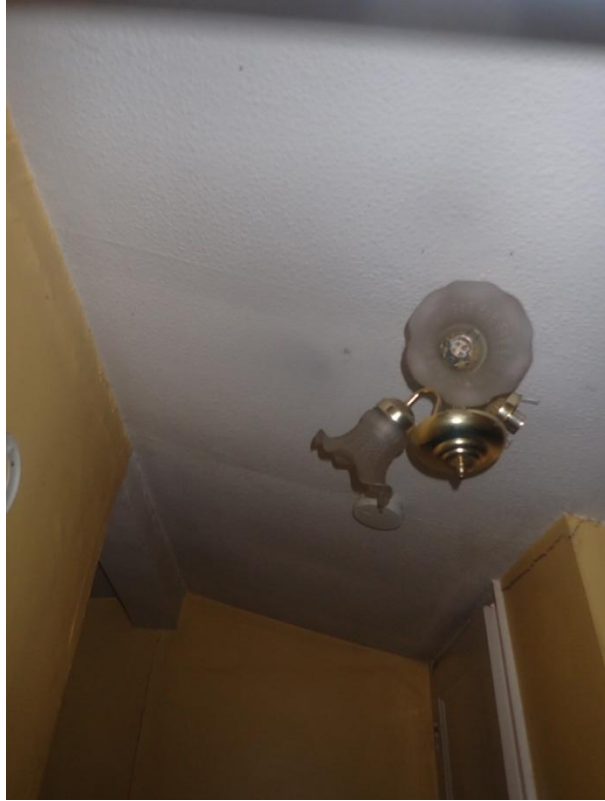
View of the north wall of the first floor landing of Building 2, from the south-west
